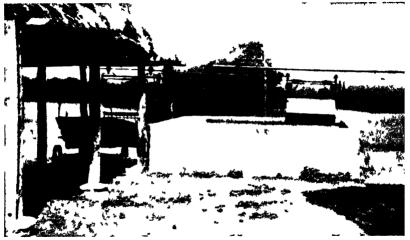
An open, concrete manure pit. If preferred a roof may be built over the pit. (Courtesy of J. A. Slipher.)
